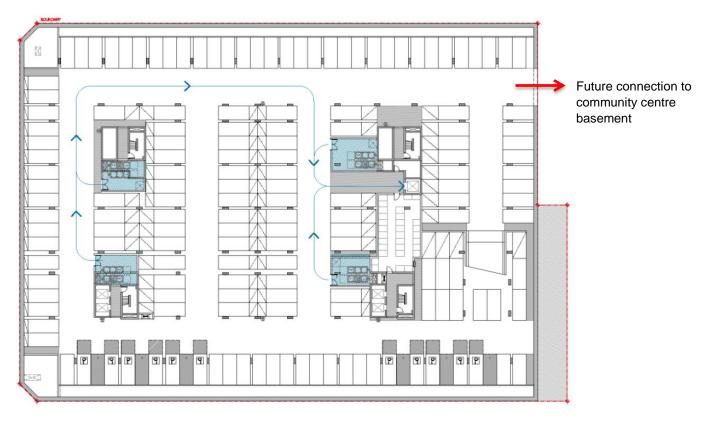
Extract of the C1 Basement Level 3 plan showing loading and the future connection to the community centre
